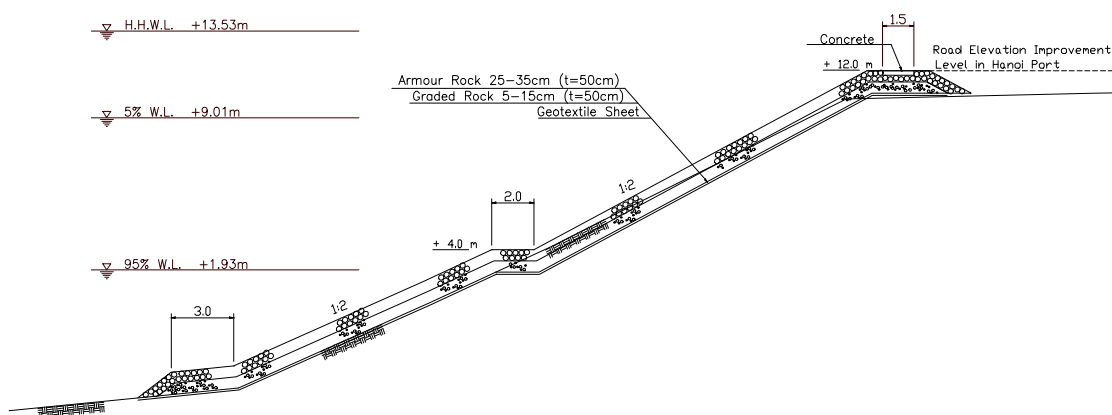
(2) Typical Profiles of Bank Protections (Bank Protection 7)
